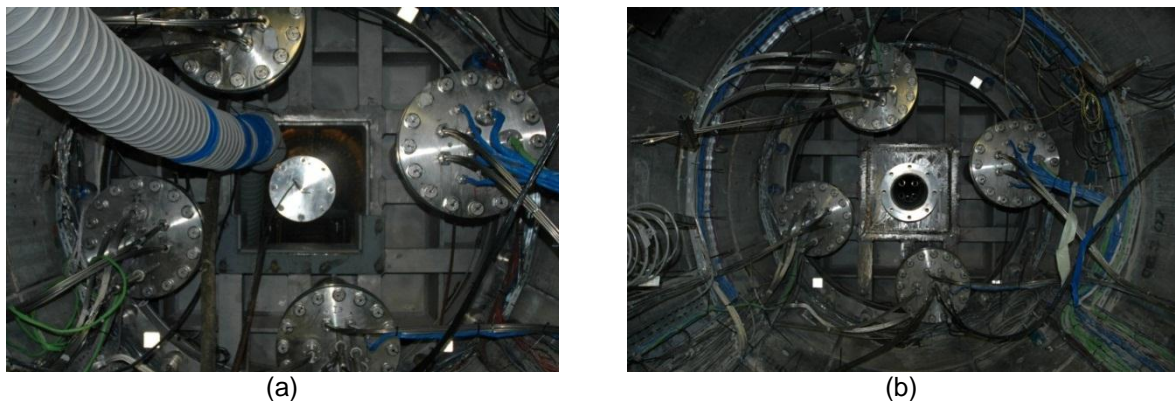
A central plate was welded onto the hydraulic seal and the central tube to close the manhole:
